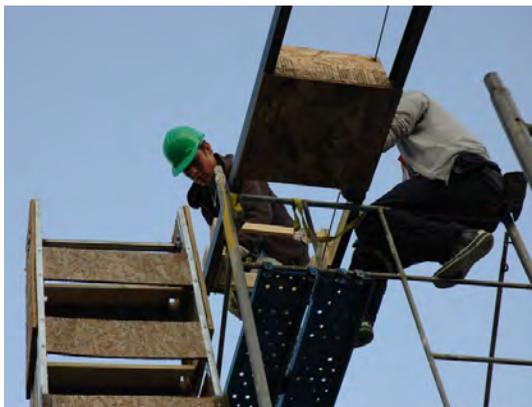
Bottom-up prefabricated components during assembly, Dec. 2008.
